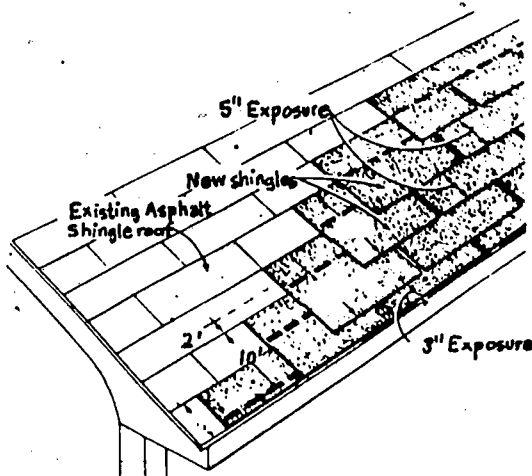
Recommended application pattern over existing asphalt shingle roof. (Asphalt Roofing Manufacturers Assoc.)
